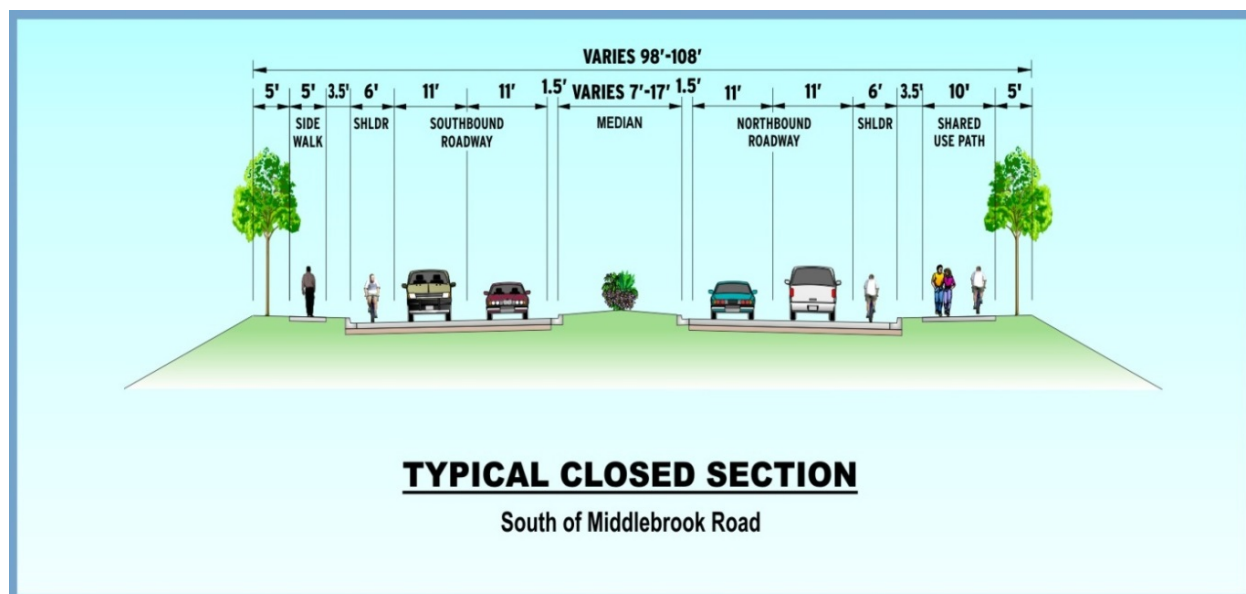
Alternatives 8 & 9 Typical Closed Section
